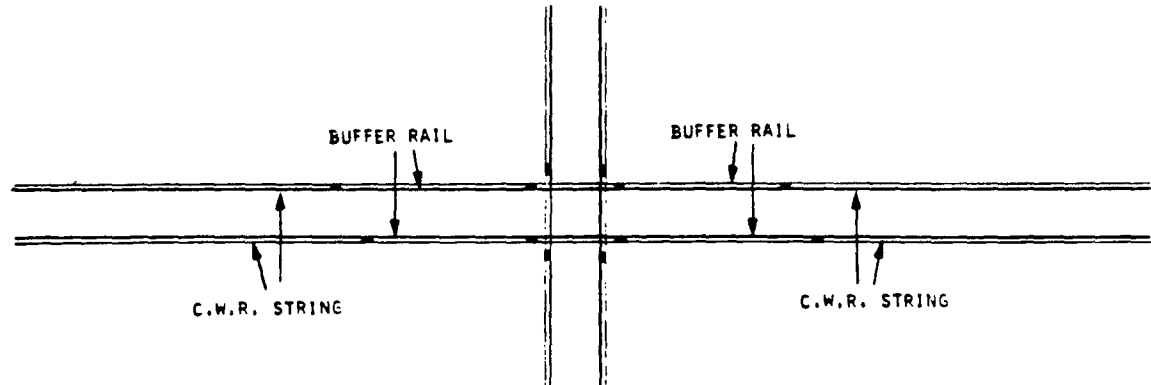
BUFFER RAILS AT DIAMOND CROSSINGS
